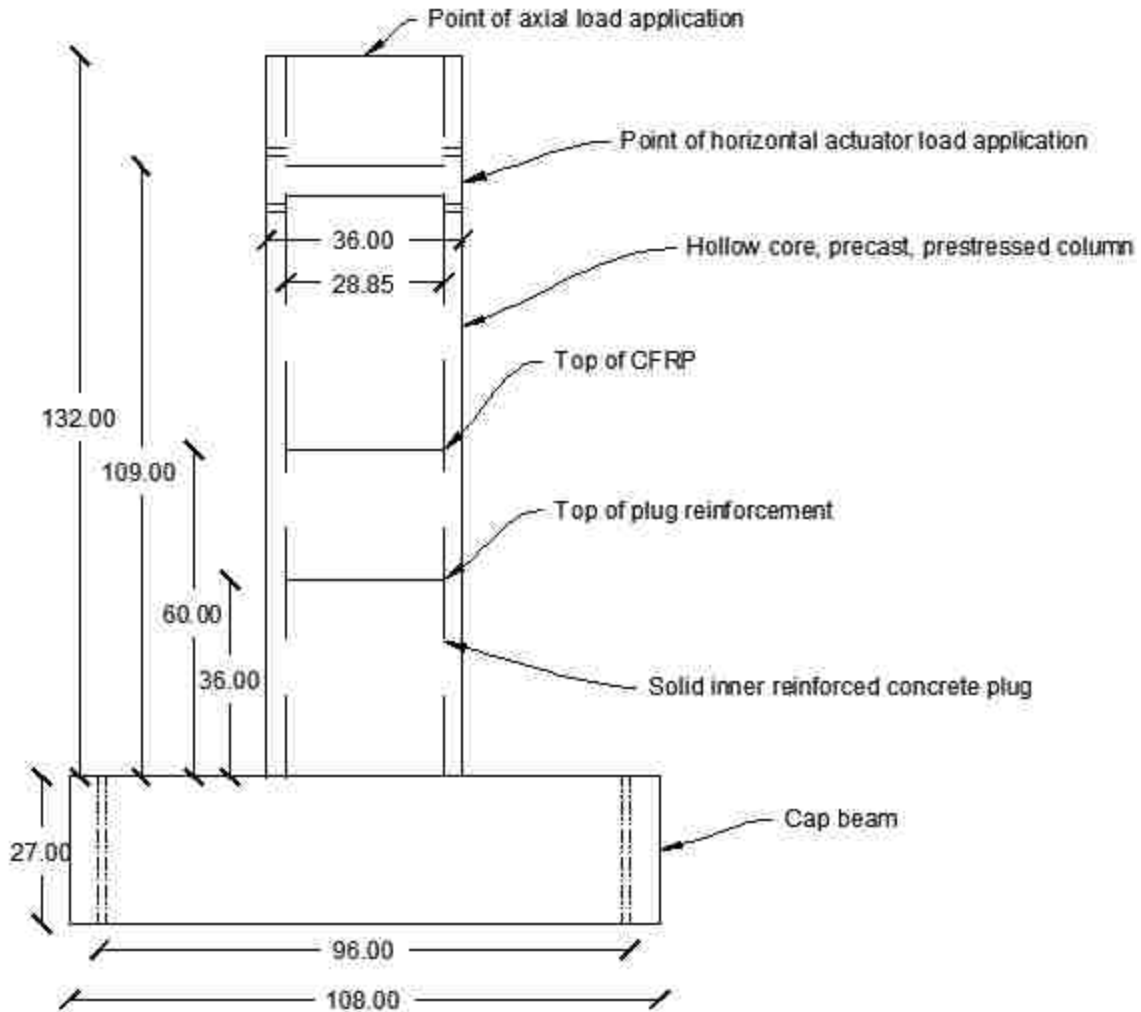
Overall specimen dimensions (all dimensions given in inches)
